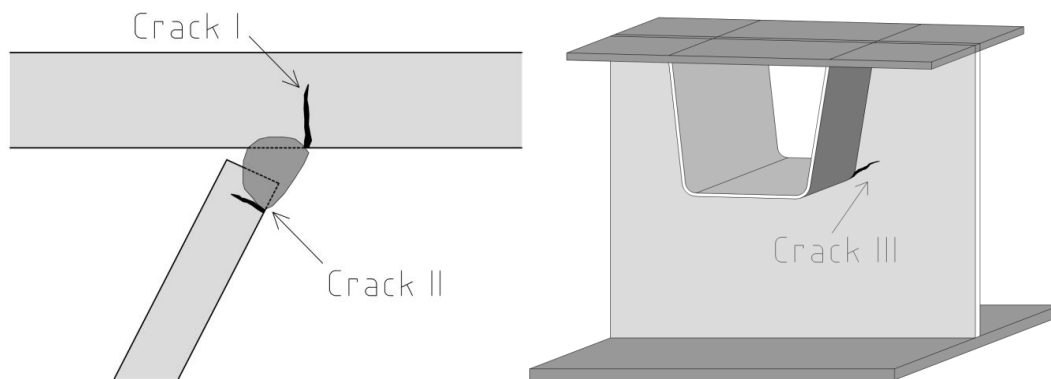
The three investigated cracks (a) Crack I and II at the rib-to-deck plate weld; (b) Crack III at the radii of the rib-to-floor beam weld.
